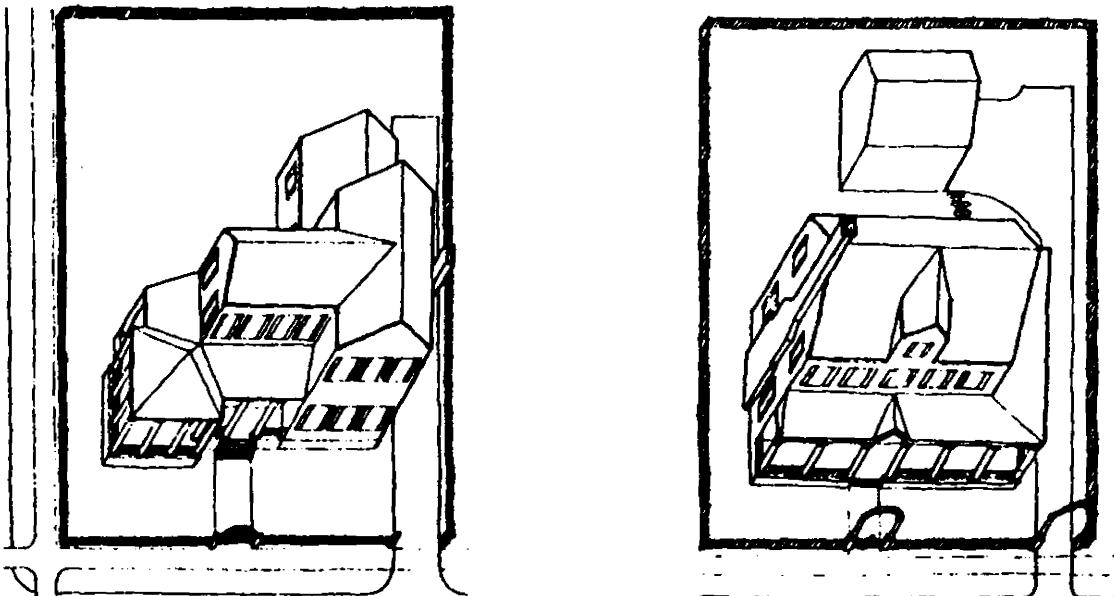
The front entrance of fifty (50) of all dwelling units should have a covered front entry porch, preferably raised a minimum of two feet above ground level.
